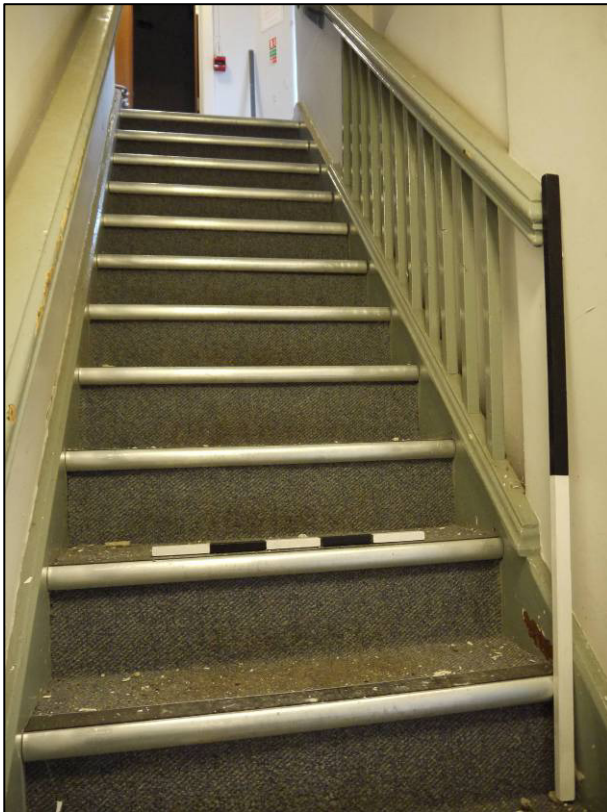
1923 house (Block 3), internal stairs, looking SE (photo 1/048).
